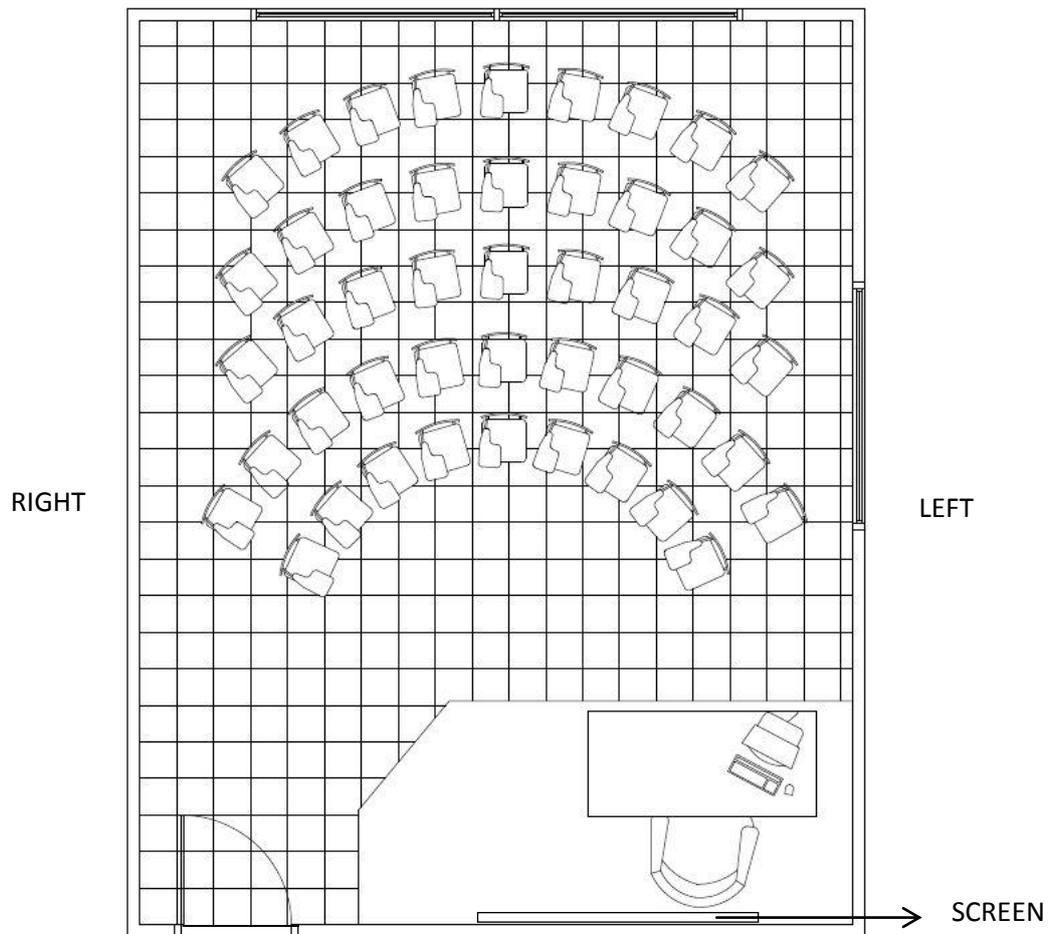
Plan of the lecture room in U- Shape seating arrangement
